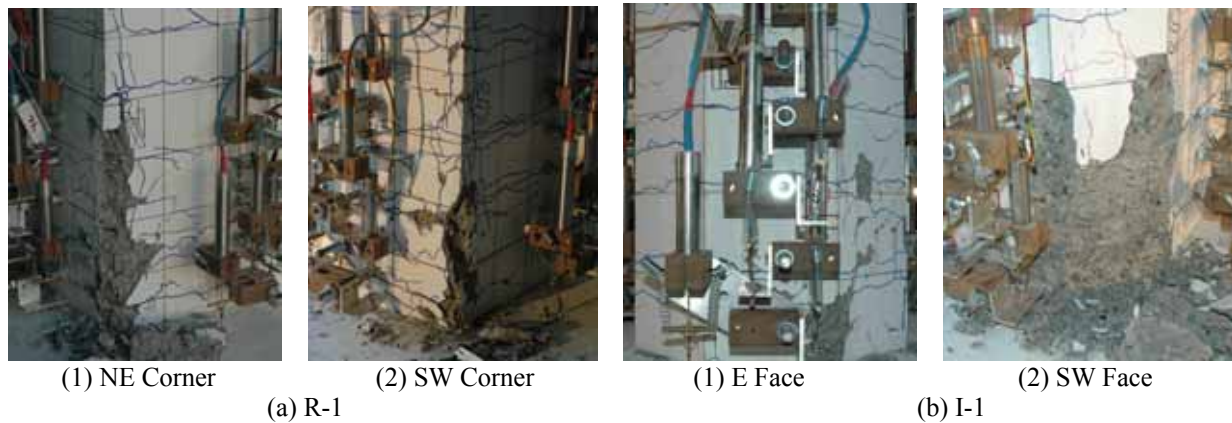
Damage of R-1 and I-1 Models after the Design Level (2) Excitation was Completed
